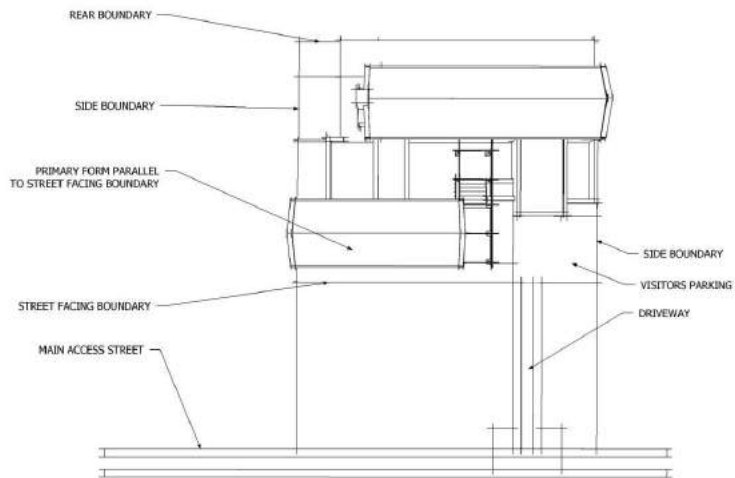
Typical Fynbos & Paddock Site House - Top View
